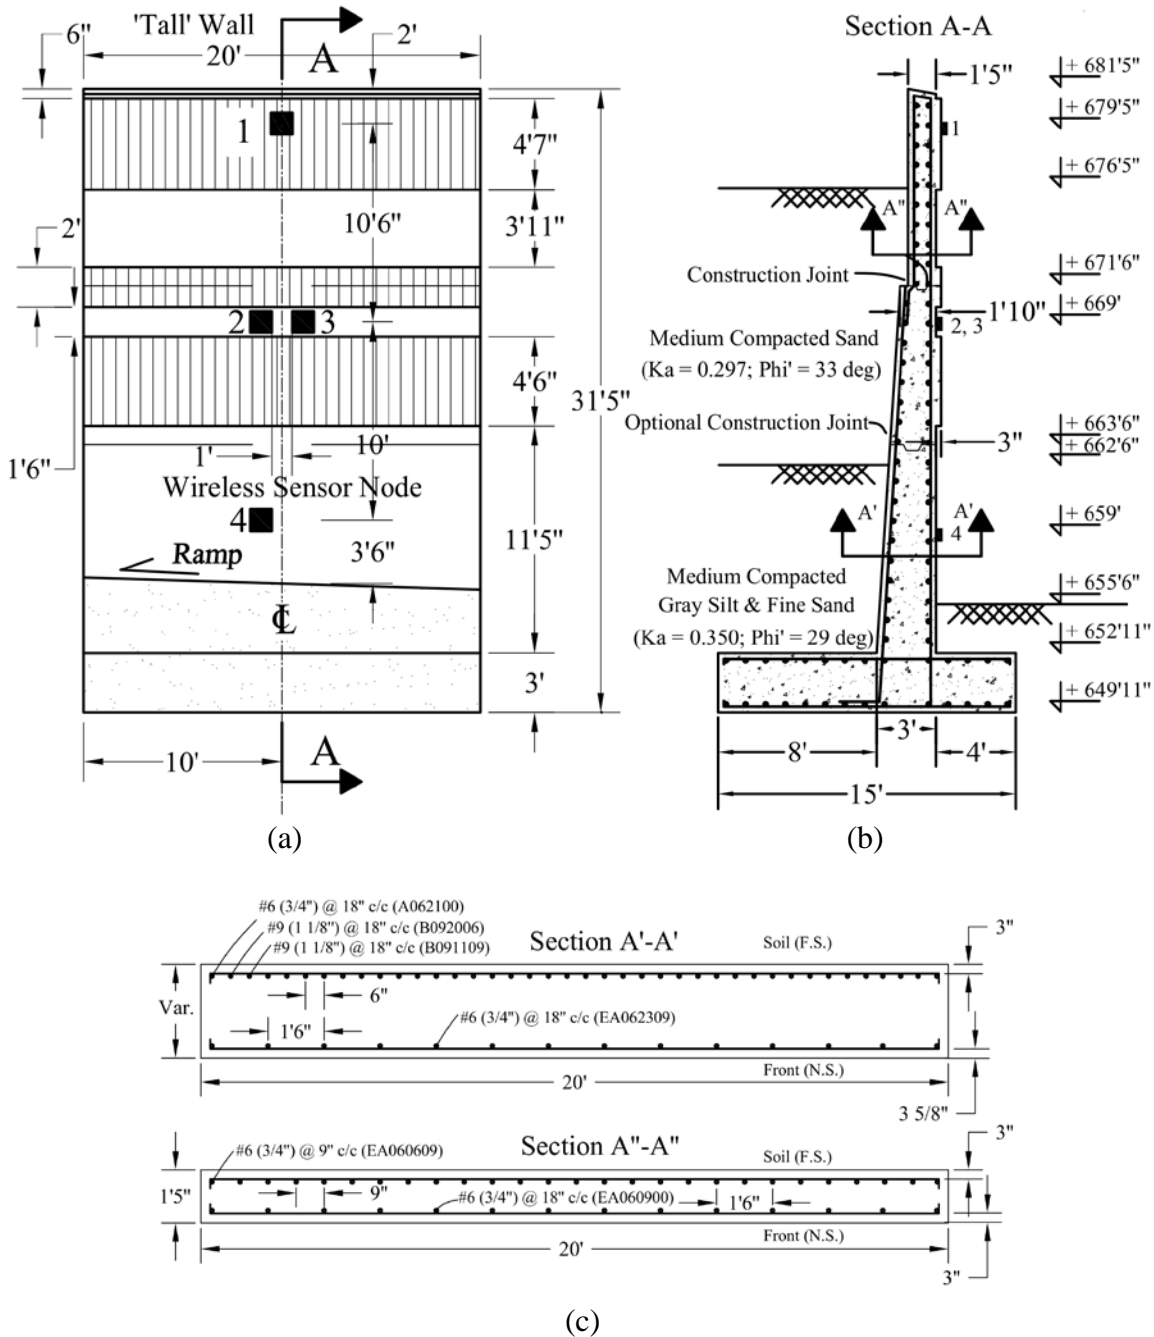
Dimensions and structural details of the ‘tall’ wall panel of the I-696 retaining wall site: (a) front side elevation showing sensor locations; (b) vertical sectional profile; (c) horizontal sectional plan.
